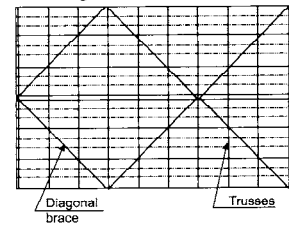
Continuous diagonal bracing of short-span roofs up to a maximum span of 8 m
